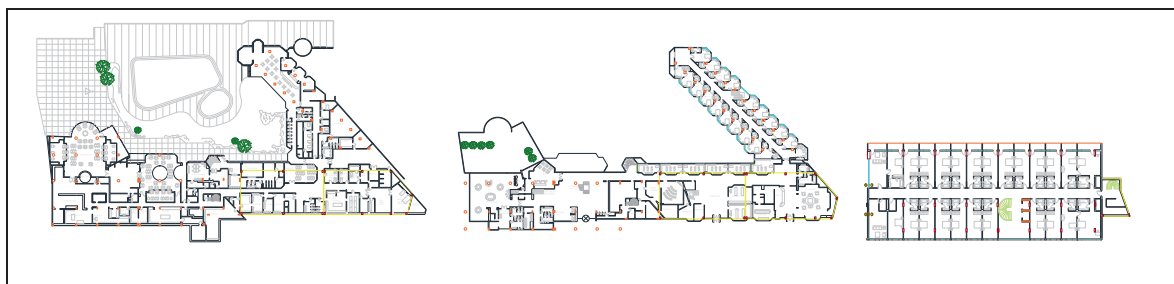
First basement floor, lobby floor plan and bedroom floor plan of Cinar Hotel.
